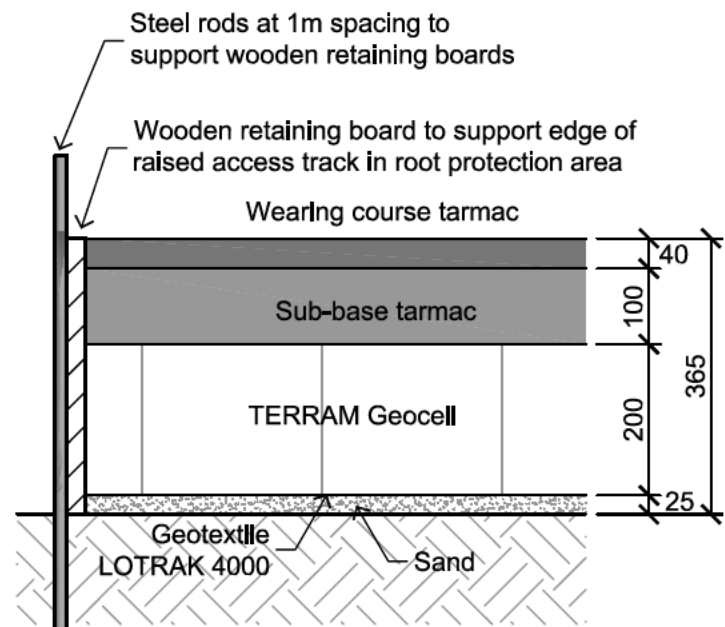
/BB/21 Rev B – Access Track Construction in Vicinity of Trees at Entrance
